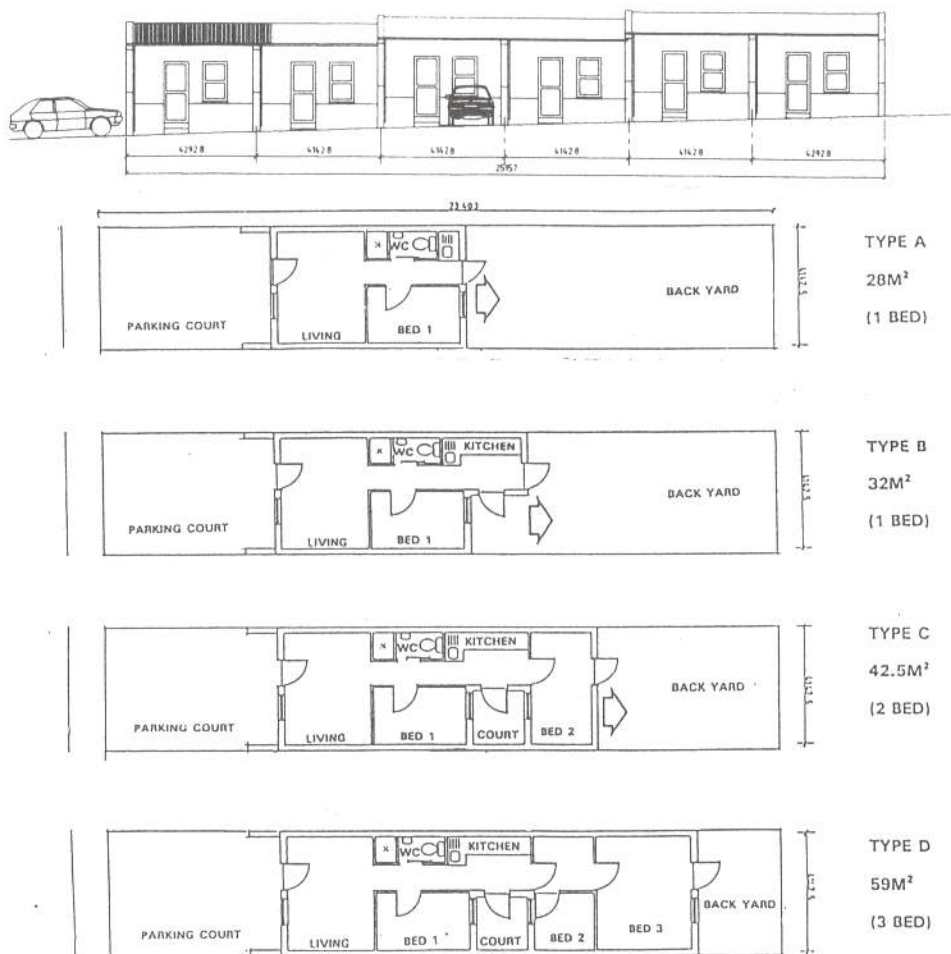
Devon Street project. Woodstock, Cape Town. Front elevations and plans. Plots are of 97 m². (This project was under construction in November 1994.) (Source: Newhco West Cape).
